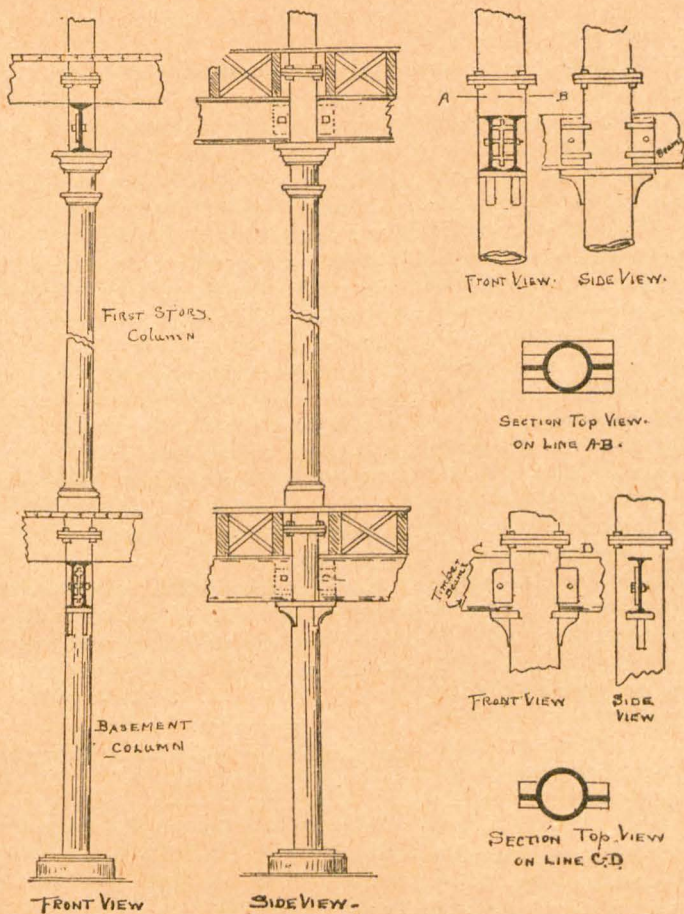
ELEVATIONS AND DETAILS OF WOOD AND IRON CONSTRUCTION.
